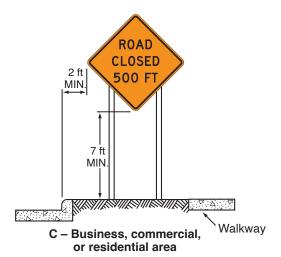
F-1. Height and Lateral Location of Signs—Typical Installations
